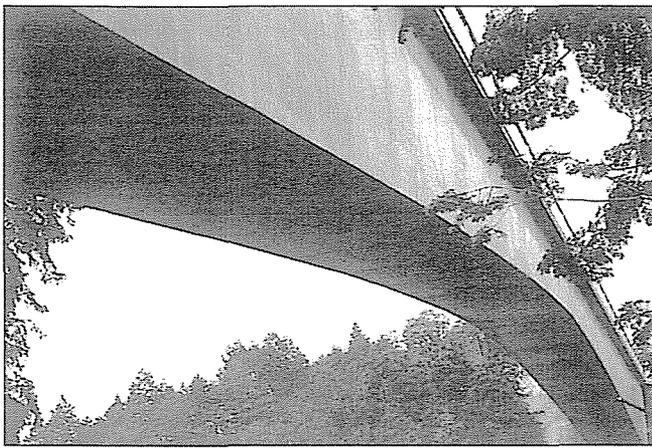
View of Tsukude Bridge (Tokyo Rope, 1993)
